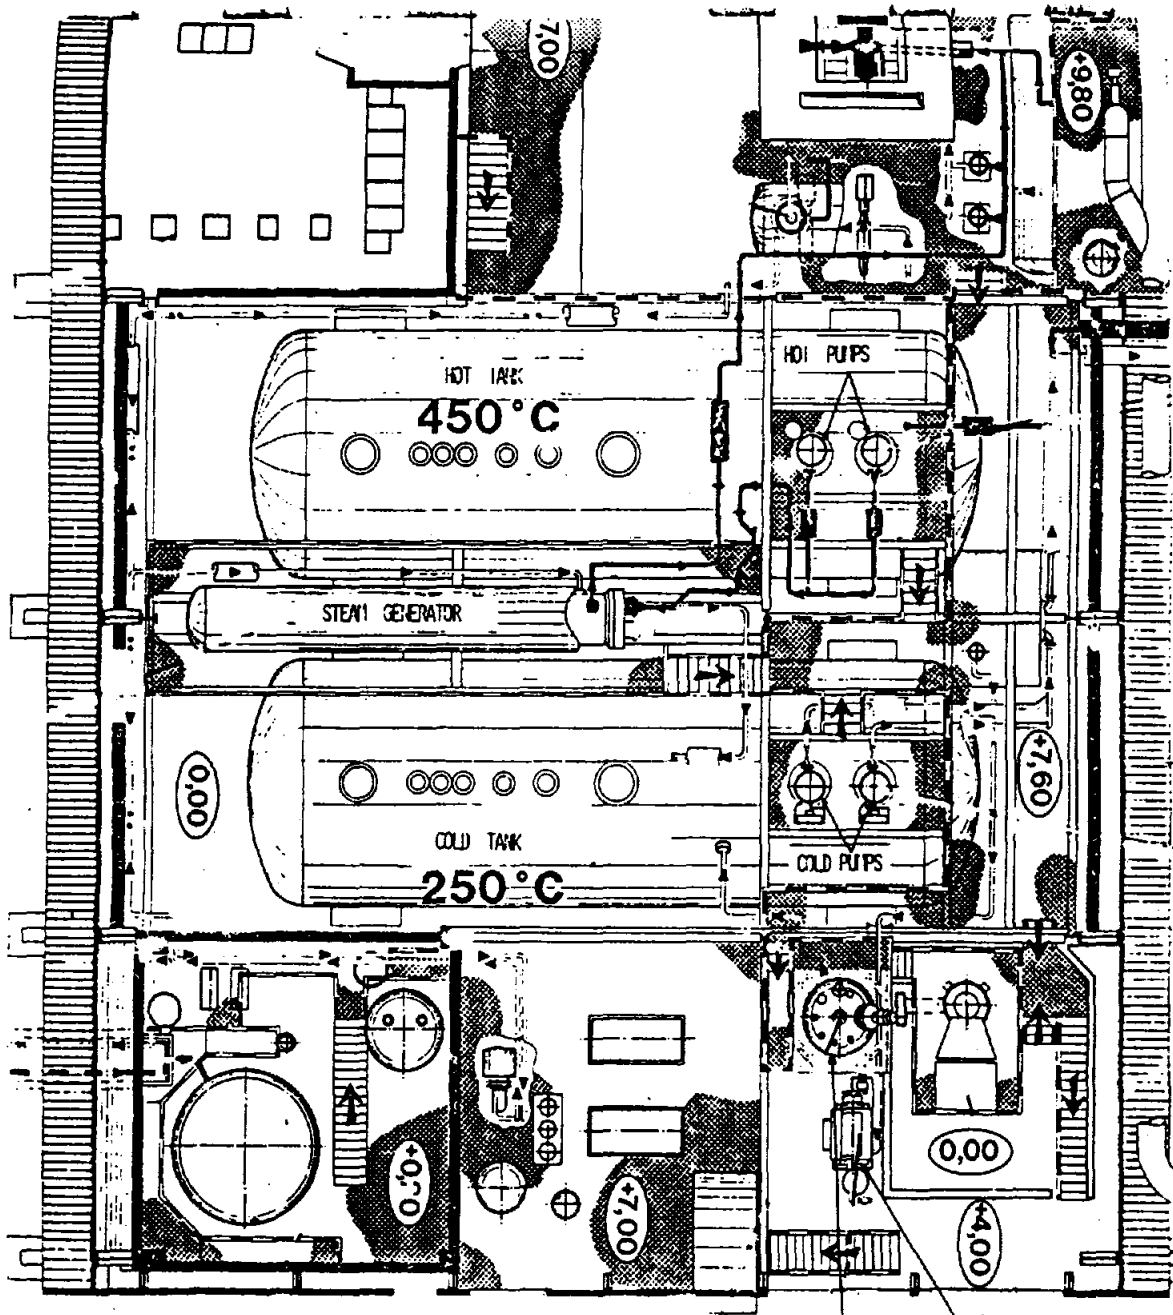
THERMAL STORAGE SUBSYSTEM LAYOUT
